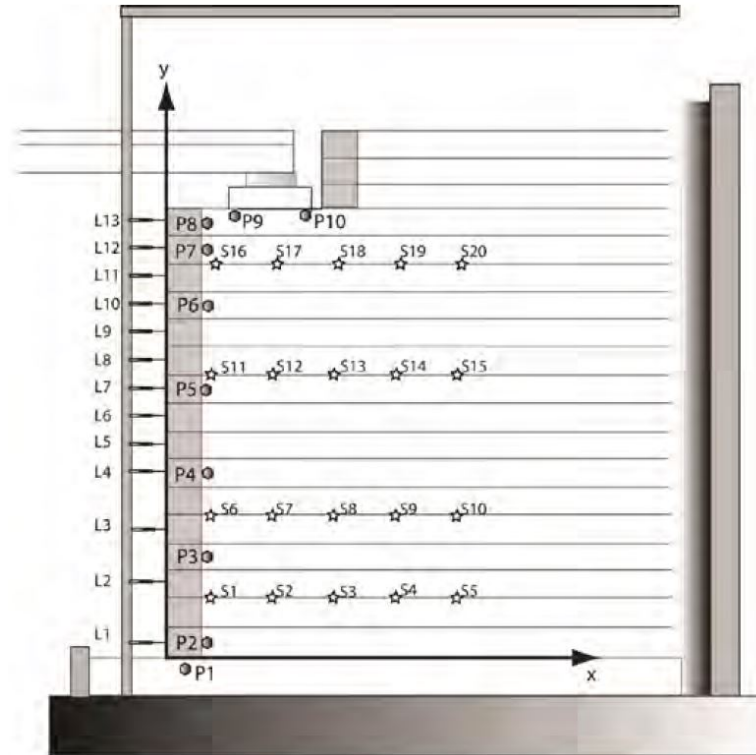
Cross-sectional view and instrumentation layout for GRS bridge abutment model (from Helwany et al. 2012).
